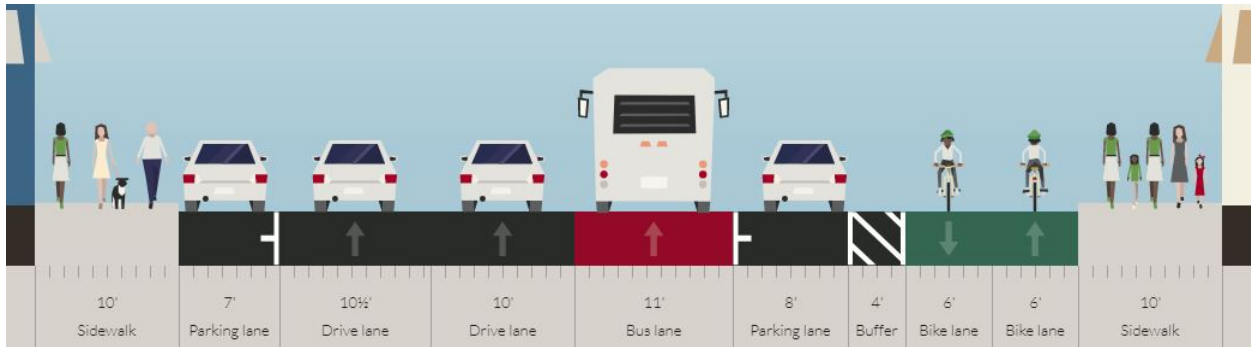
Typical Cross Section of Folsom Street between 10th and 8th streets, looking east
